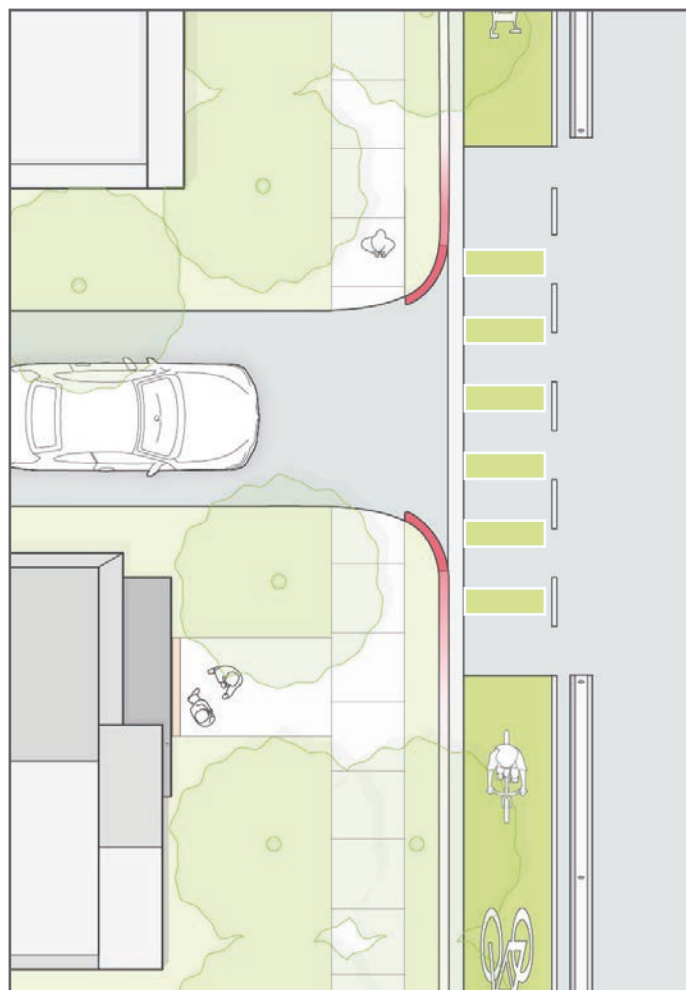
Driveway Treatment for Separated Bike Lane
